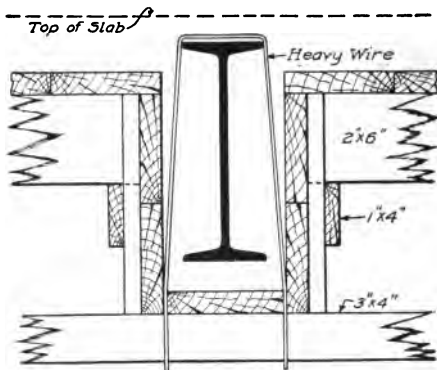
Forms for Fireproofing I-Beams and Supporting Concrete Slab
